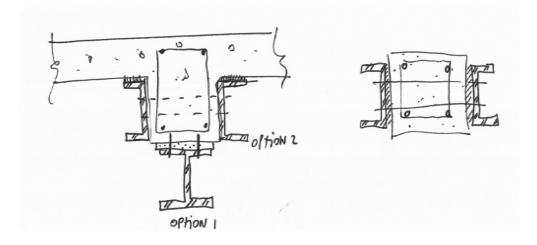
Added steel to resupport (option 1) or reinforce (option 2) a concrete beam (left). Reinforcing of a column with steel channels (right)
